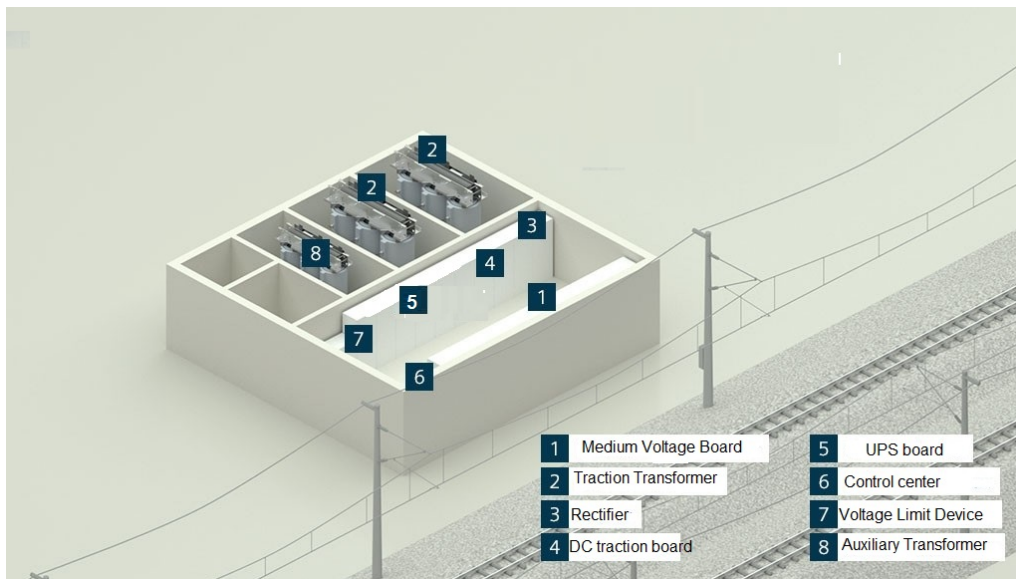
Inside overview of a typical traction power substation [Adapted from Siemens]
